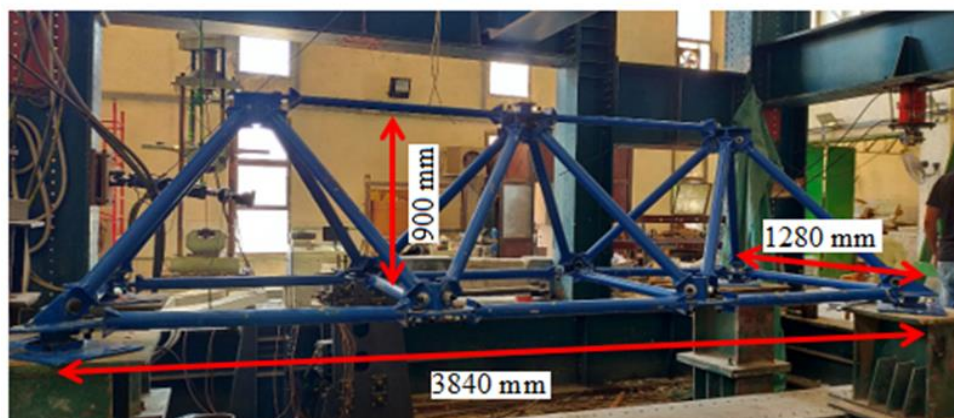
Photo and Layout Dimension of Space Truss. [16]
